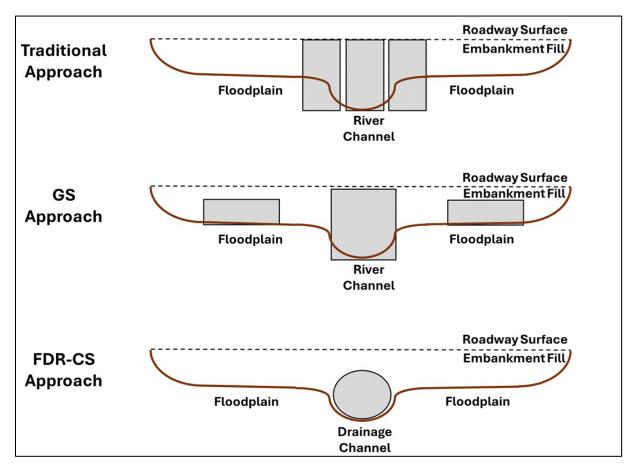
Conceptual comparison of culvert opening cross-sectional area and distribution in a river valley, resulting from traditional, geomorphic sizing (GS), and flood damage reduction culvert sizing (FDR-CS) road crossing approaches as applied in a small drainage basin. While traditional and GS cross-sectional areas are the same, the GS distribution
